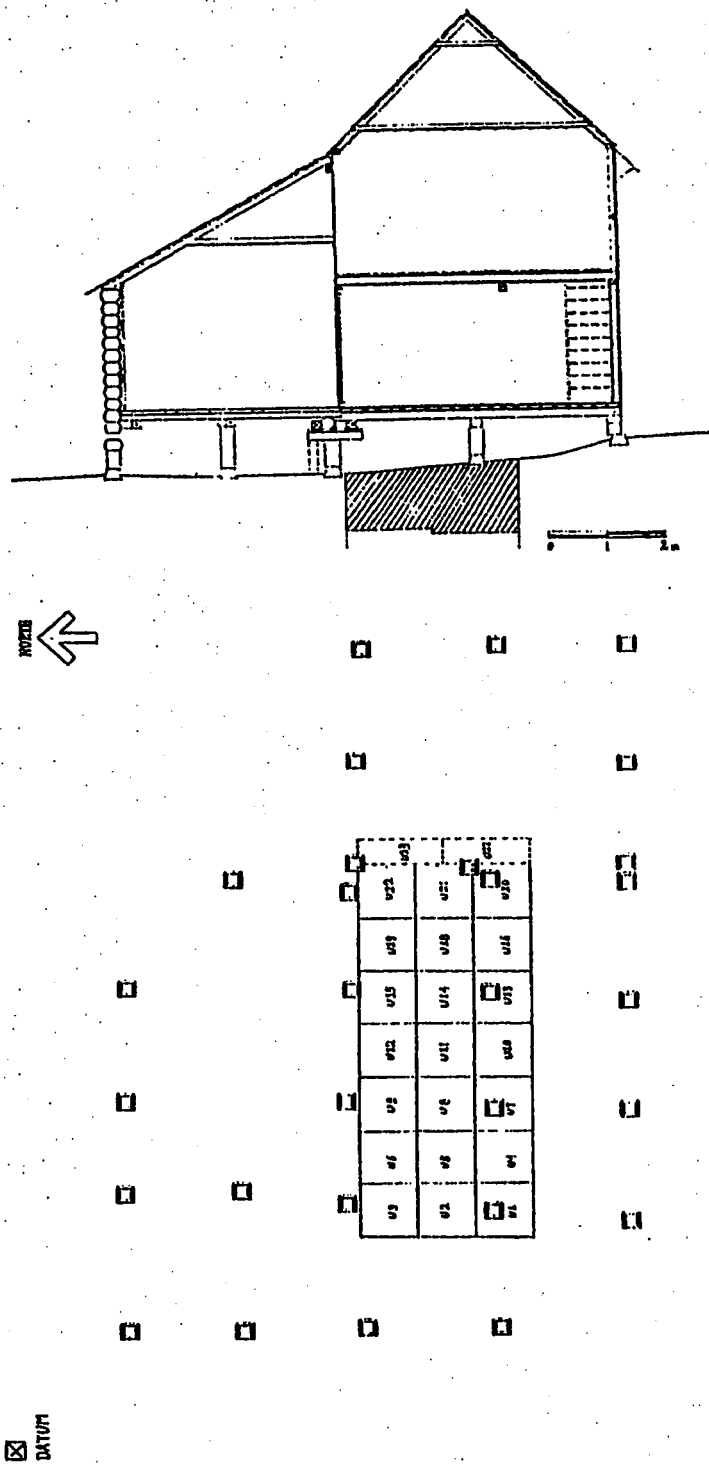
Location of the excavation area at Lot 69. (Above) cross section of the Chih Kung Tang house and the excavation Area. (Bottom) plan of the foundation of the building with the concrete footings installed by the town after the 1960s (after Richard Caywood with some alterations).
